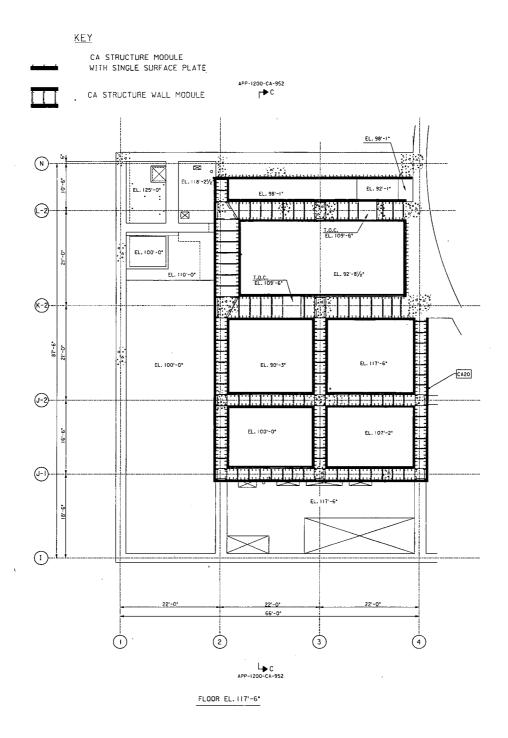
Structural Modules in Auxiliary Building (Sheet 4 of 5)
